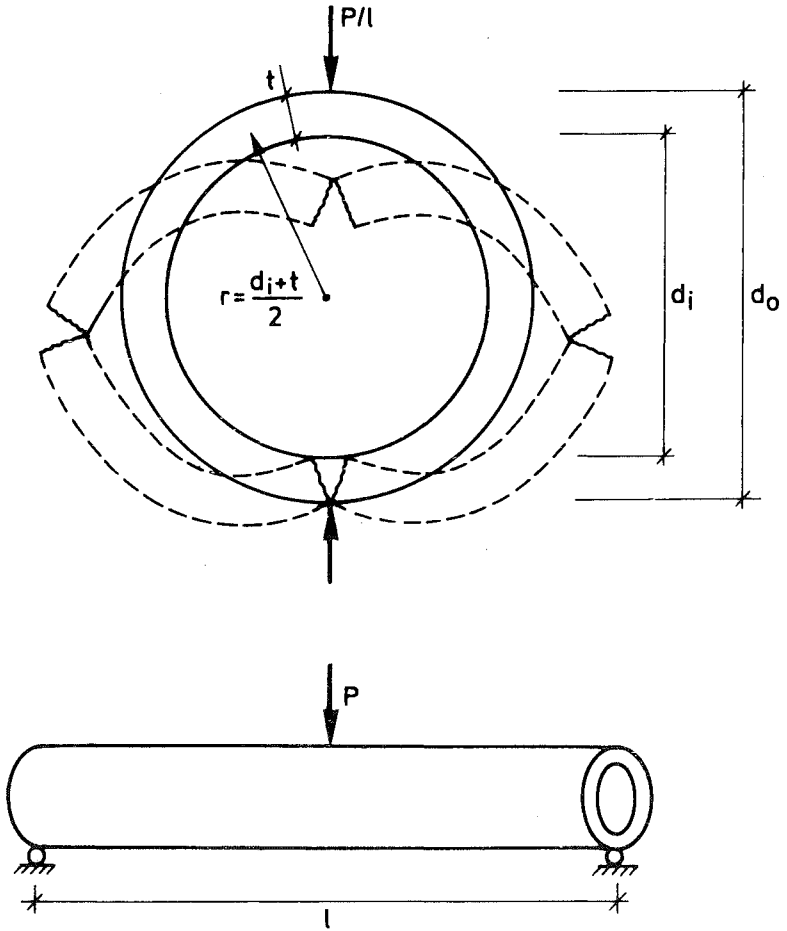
(1) a) Geometry of cross-section of pipe. Deflected form after crushing failure caused by line-load P/l is indicated by the dotted figure.
